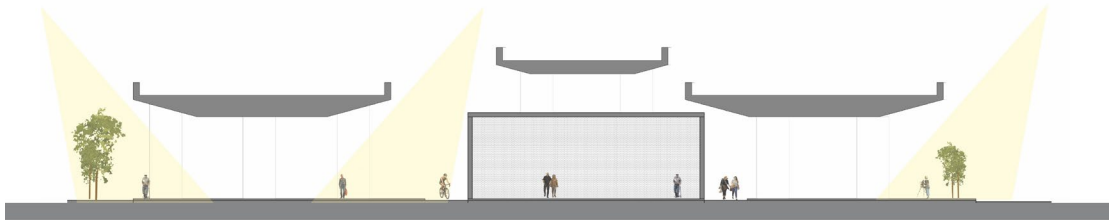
, Underpass - Section - EW – 395 (Source: Drawn by Author)
